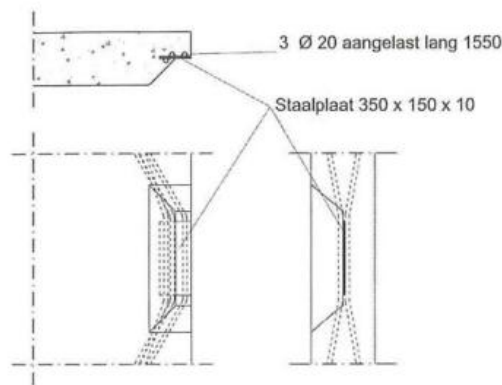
Welded steel plates that are casted in the concrete [Falger 2004]
